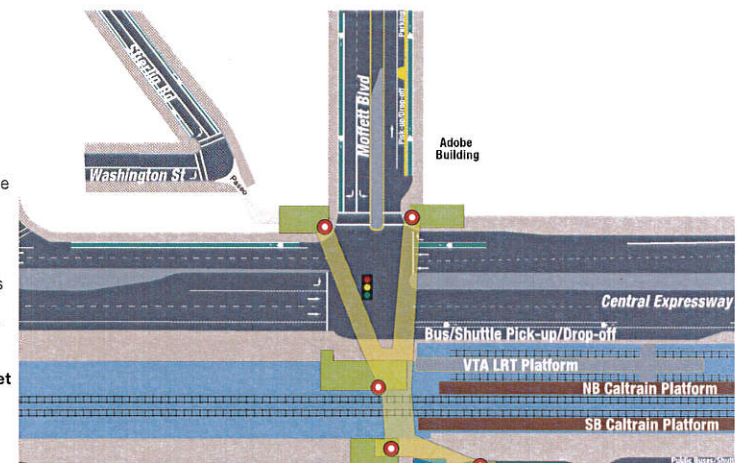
Plan View of Intersection of Moffett Blvd/Central Expy
